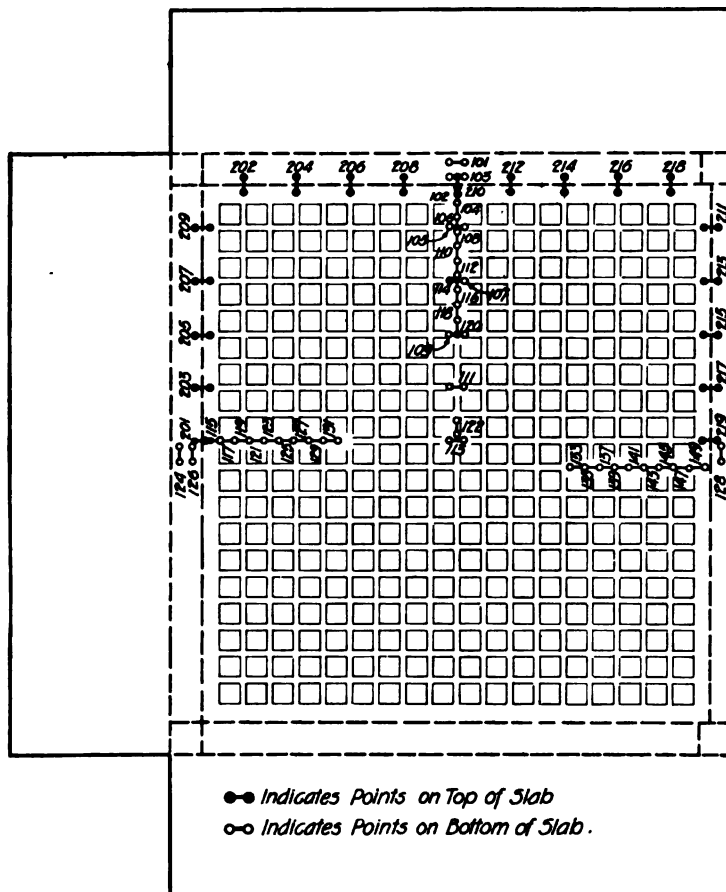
PLAN SHOWING LOCATION OF GAUGE POINTS ON REINFORCEMENT.
